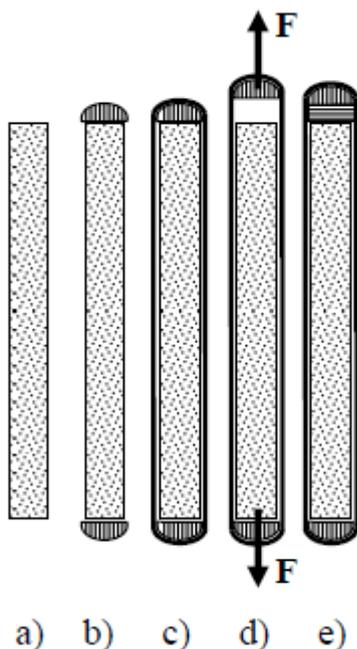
Conception for post-tensioning with CFRP straps shown on the example of a steel rebar reinforced concrete shear wall: a) cross section of shear wall, b) addition of semi-elliptical inter-face pad elements that are placed on the bottom and top faces of the shear wall, c) the layers of the CFRP tapes are wound around the pads and shear wall and the end of outermost layer is welded to the second outermost layer, d) the straps are tensioned by lifting the top interface pad using a jacking system, e) the post-tensioning force is applied to the concrete by overstressing the straps, inserting spacers between the interface pad and the shear wall and then releasing the tensioning force.
